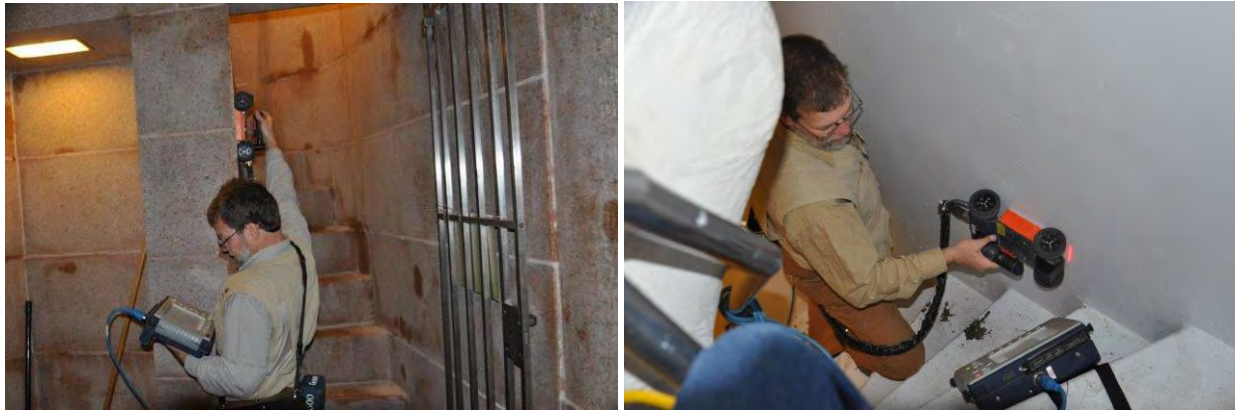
Surface penetrating radar scanning. Left: calibration at stone in lobby; right: scanning at interior concrete, 2nd level.
